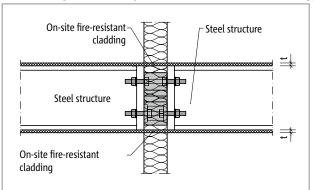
Fire protection Schöck Isokorb® T type S: On-site fire protection cladding for flush frontplates; section
